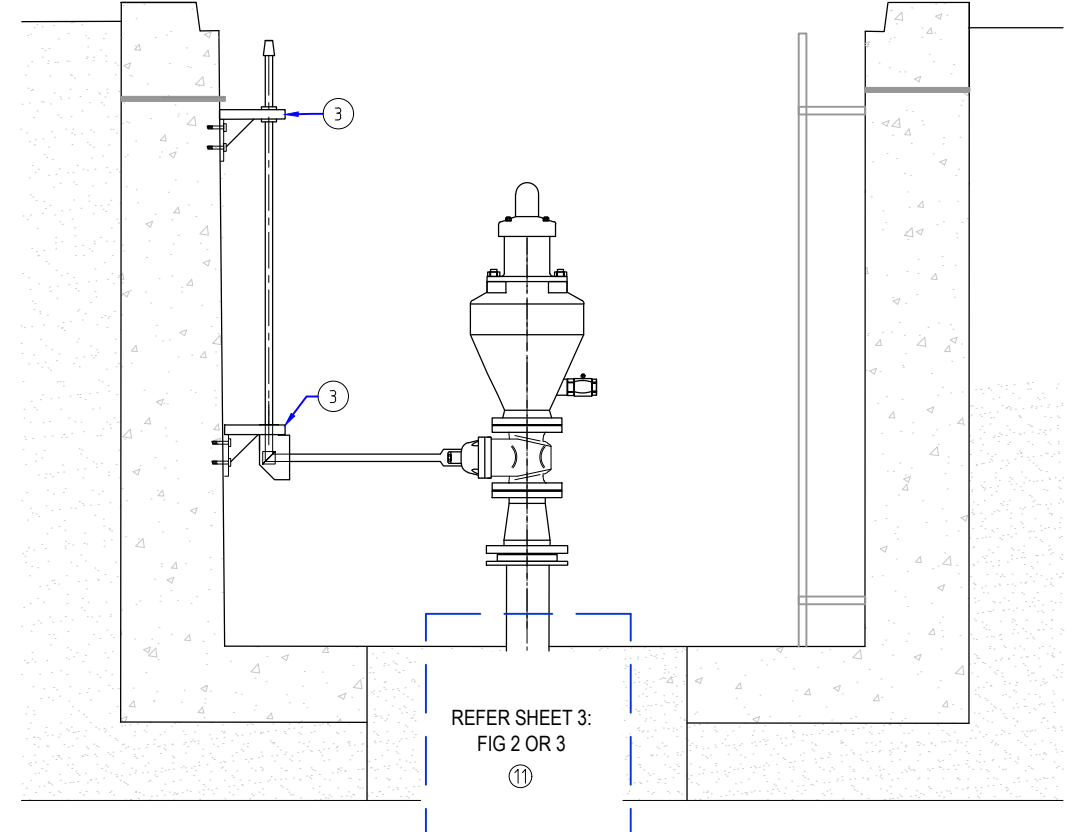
BELOW GROUND AIR VALVE AND CARBON CANISTER ASSEMBLY (SECTION B)
